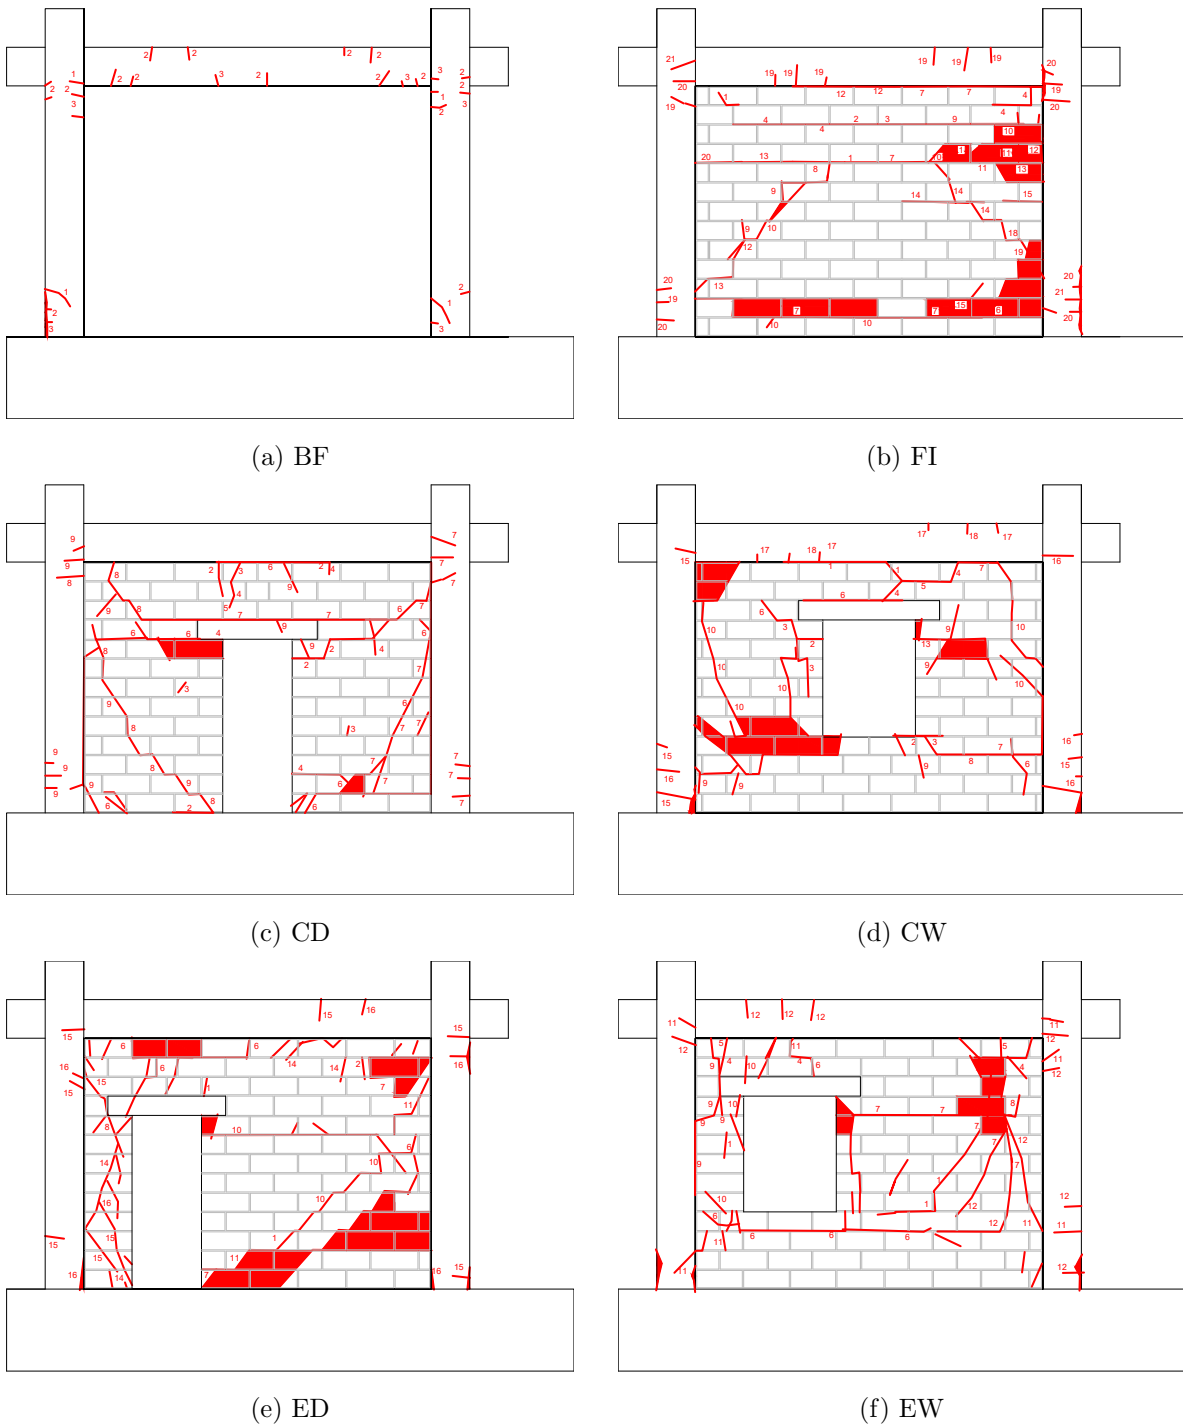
In-plane cyclic, quasi-static test crack patterns
